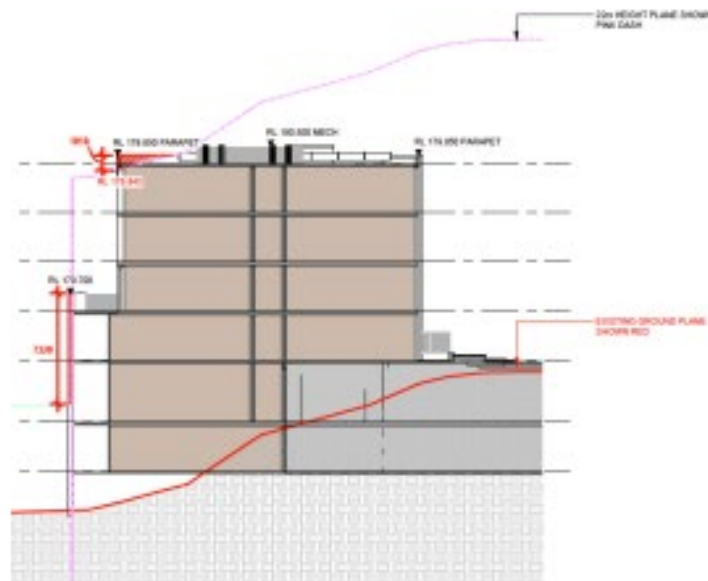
Cross Section 2 – Building M (Cox drawing DA-99-12)
